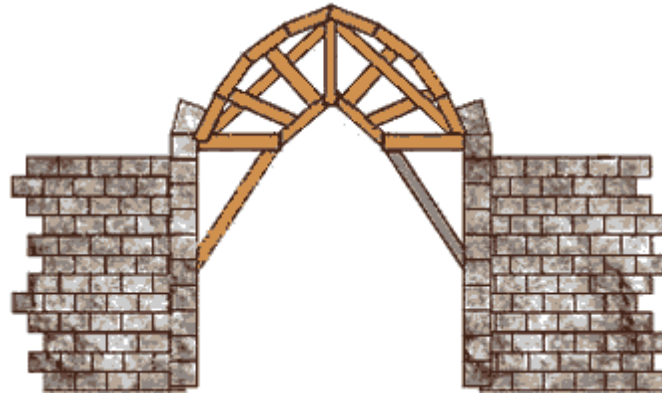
Wooden formwork supported on arch piers for the construction of masonry arches. (Norman)
